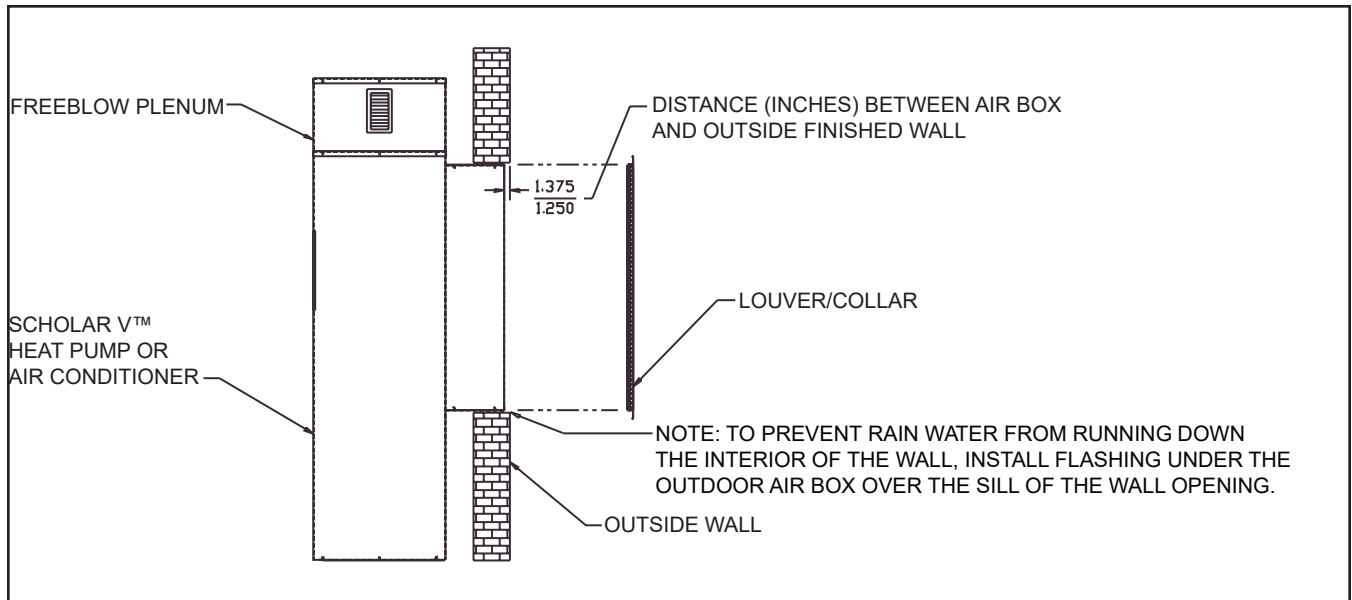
Dimension between Vanguard Air Box and Finished Outside Wall for Outdoor Louver/Collar Assembly Installation.
